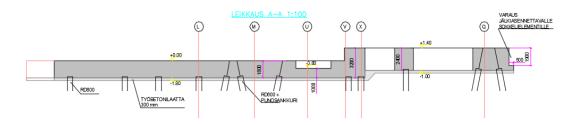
Cross section of the foundation showing slab thickness variation and respective elevation.
